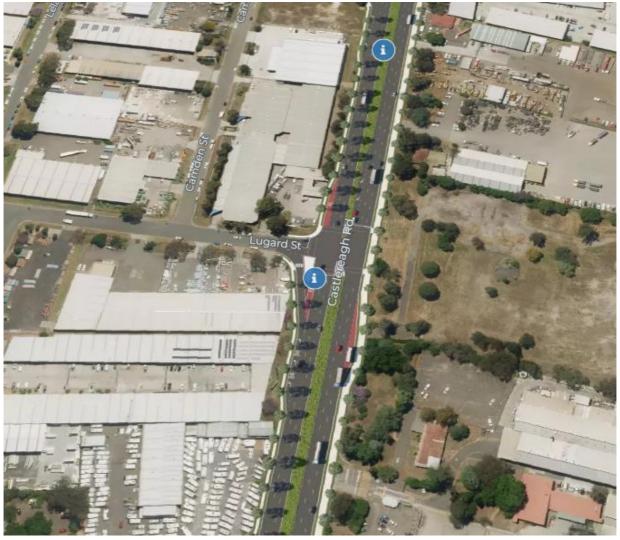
Castlereagh Road / Lugard Street Intersection Upgrade
